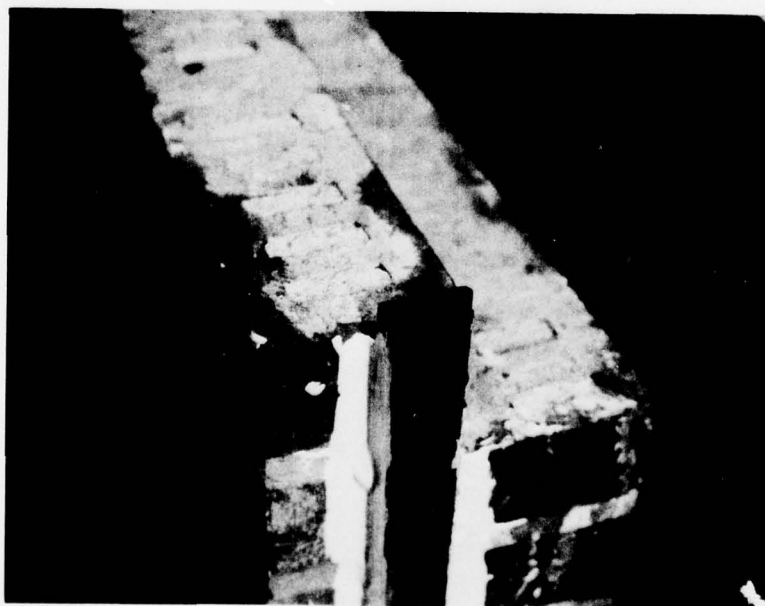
Plywood with caulking was screwed to the end of the brick wall to stop leaks from between the wall layers
